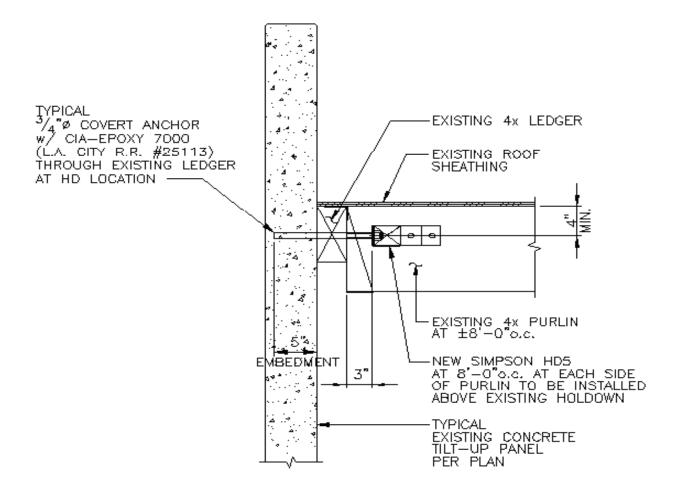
TYPICAL PURLIN TO EXISTING CONCRETE CONNECTION DETAIL
